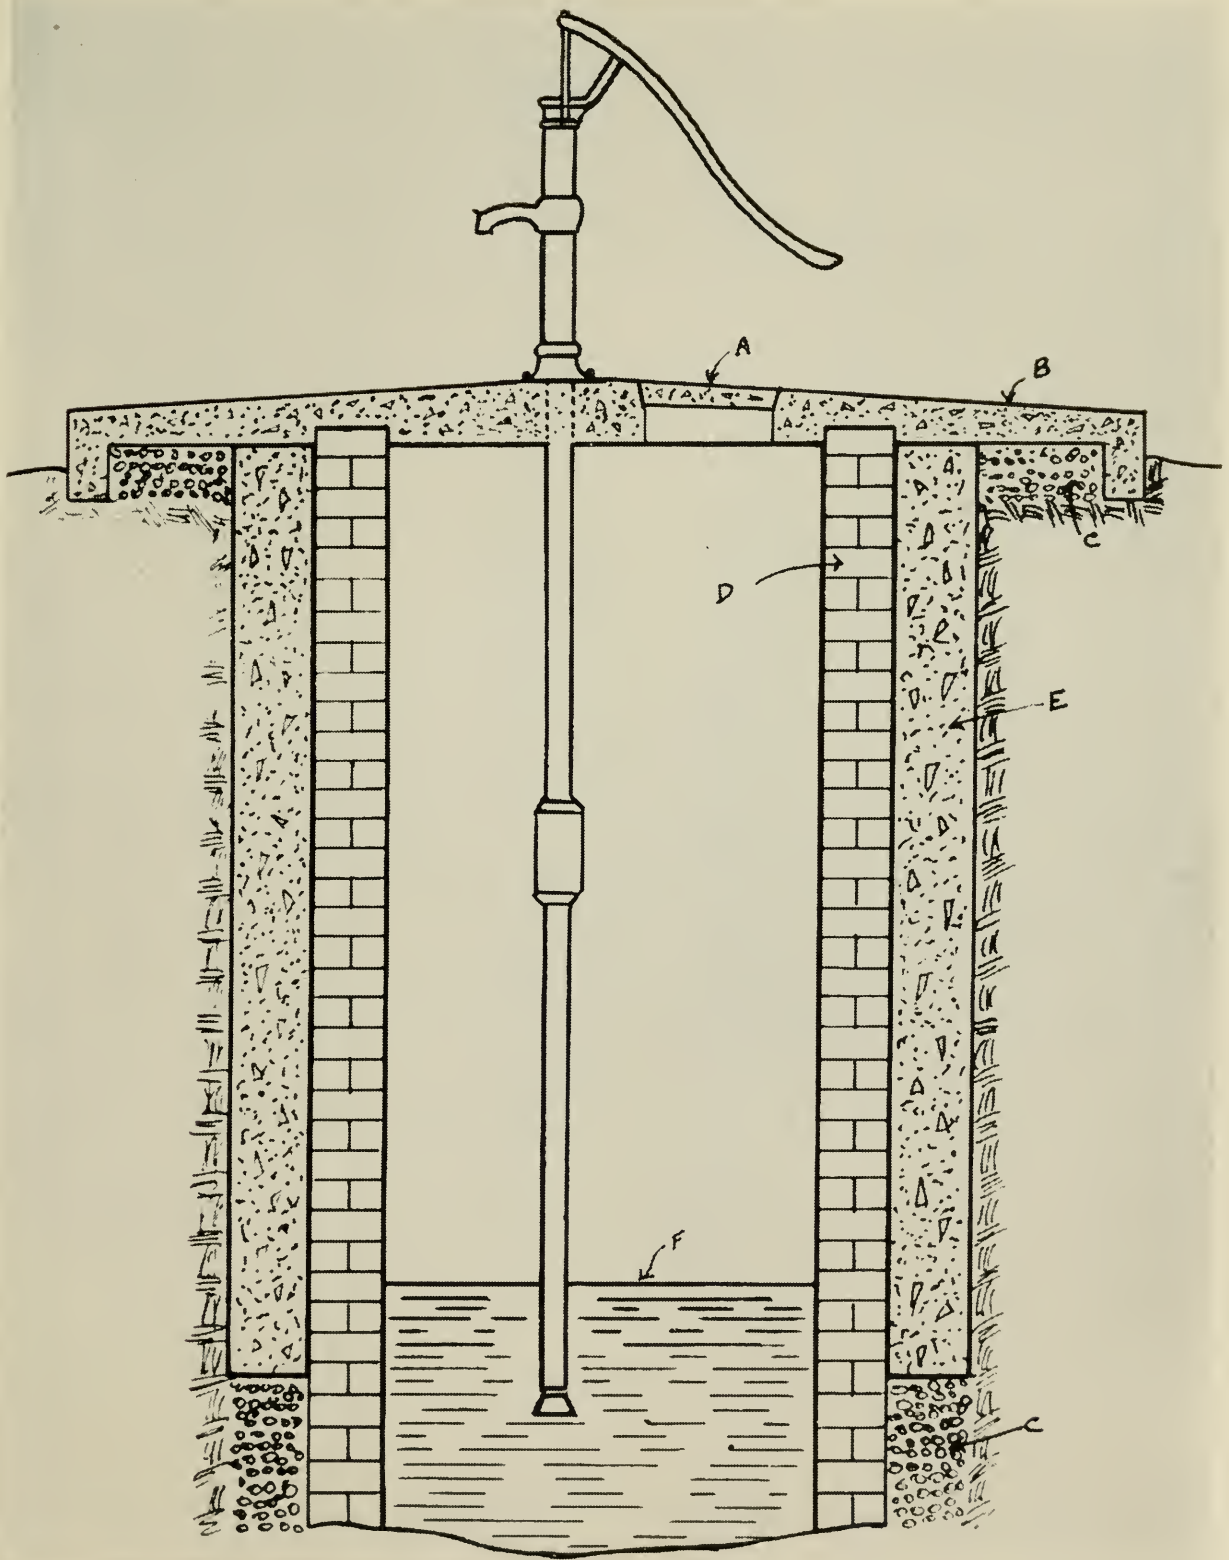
Properly constructed well. (A) Man-hole, (B) sloping cement top, (C) gravel, (D) inside brick wall, (E) outside cement wall occupying upper 10-12 feet, (F) water level. (E.H.G.)
